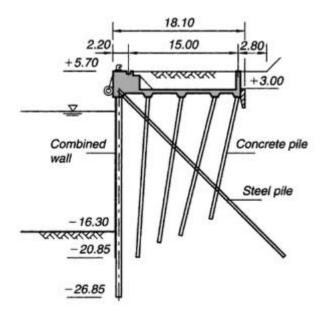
Example of a combined sheet pile quay wall with concrete capping beam in Hansaport, Hamburg. Source: de Gijt & Broeken (2005)
